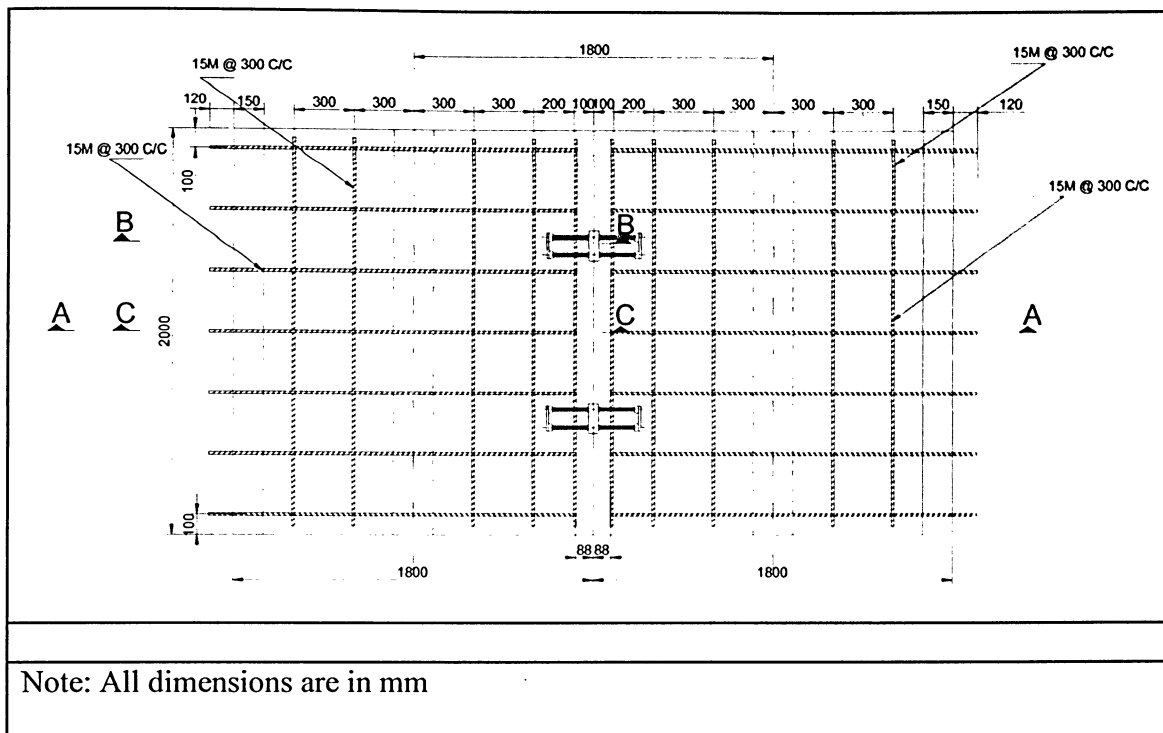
(c) Plan of Bottom Rebar Arrangement for Model M4
